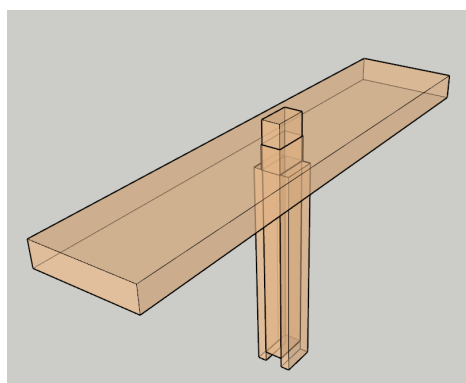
Band Beam to Column connection (Image credit: XLam Australia)
